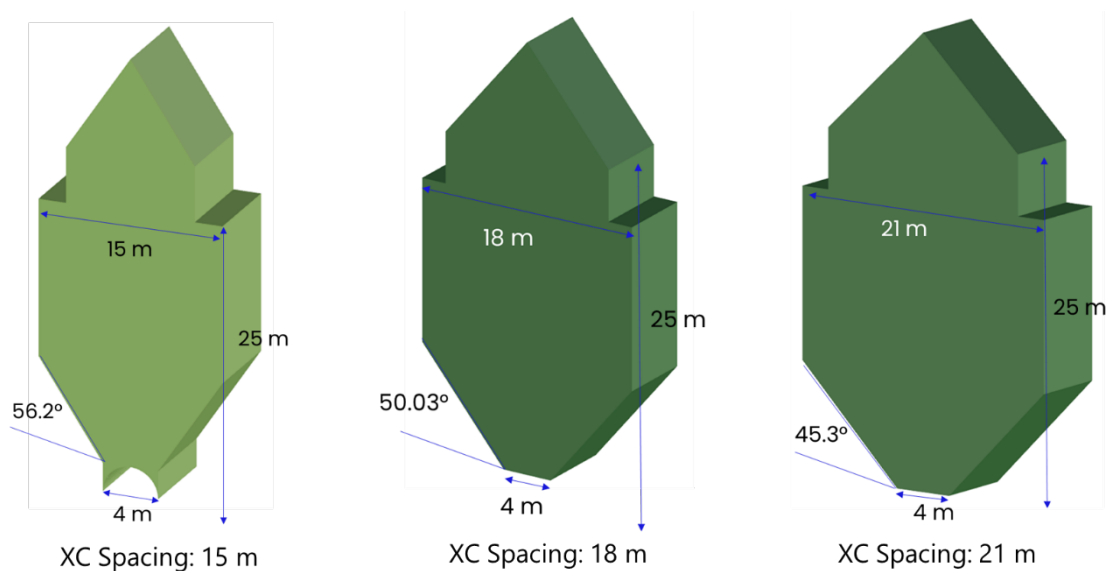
15, 18 and 21 m crosscut spacing ring designs
